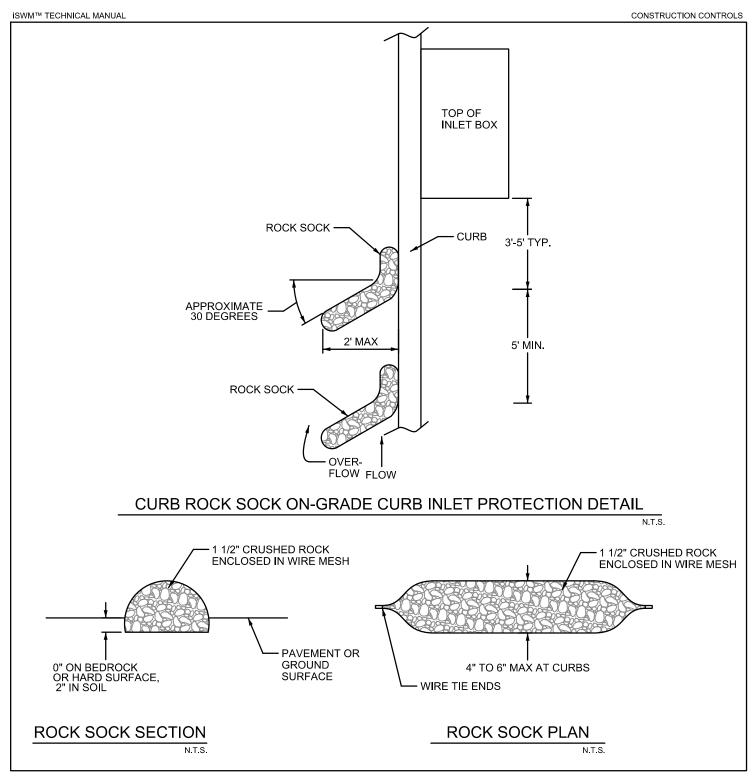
STANDARD CONSTRUCTION DETAIL - CURB ROCK SOCK ON-GRADE CURB INLET PROTECTION (1 OF 2)
